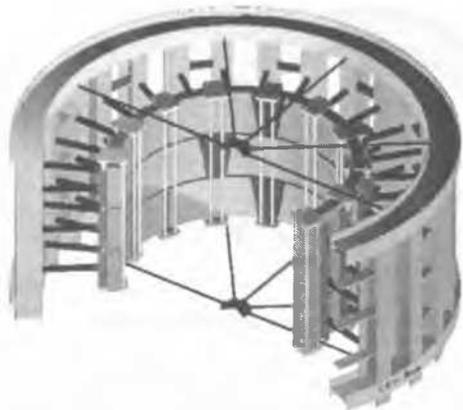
Experimental test setup for large scale testing of tunnel loading situations, (v.d Horst et al 1999)
